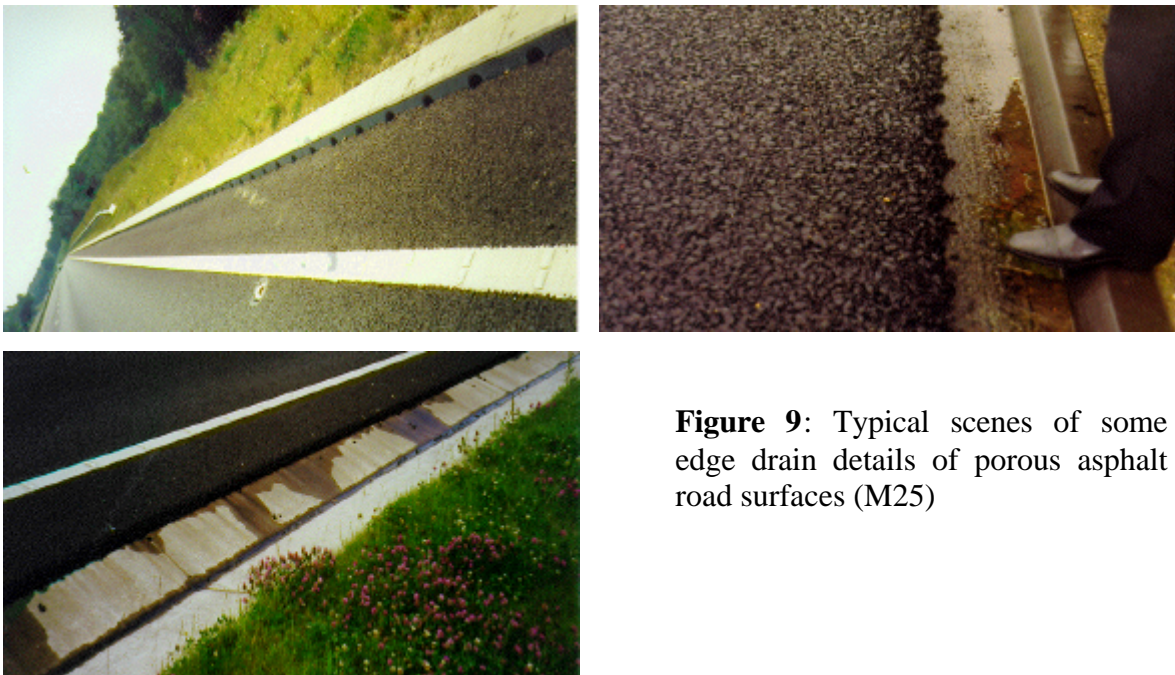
Typical scenes of some edge drain details of porous asphalt road surfaces (M25)
